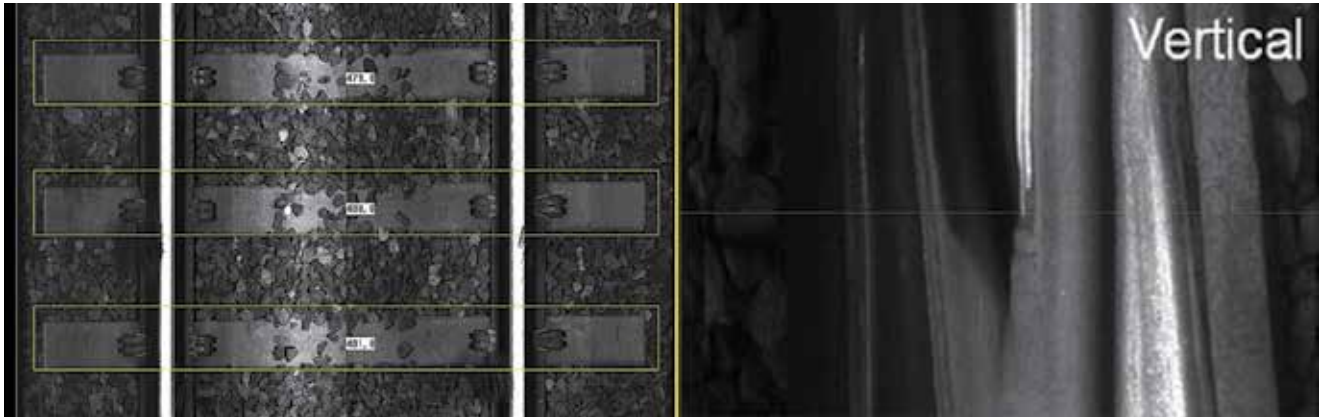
Track surface inspection system – checking sleepers & switches validation [10]
